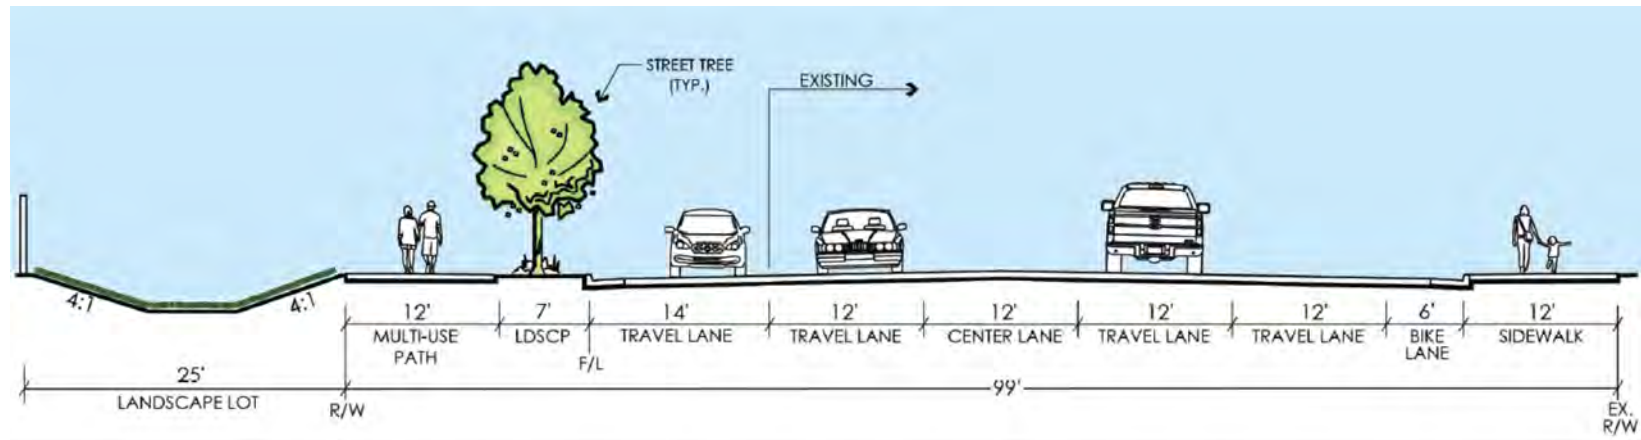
SERVICE ROAD (WEST OF HIGH SCHOOL SITE)
